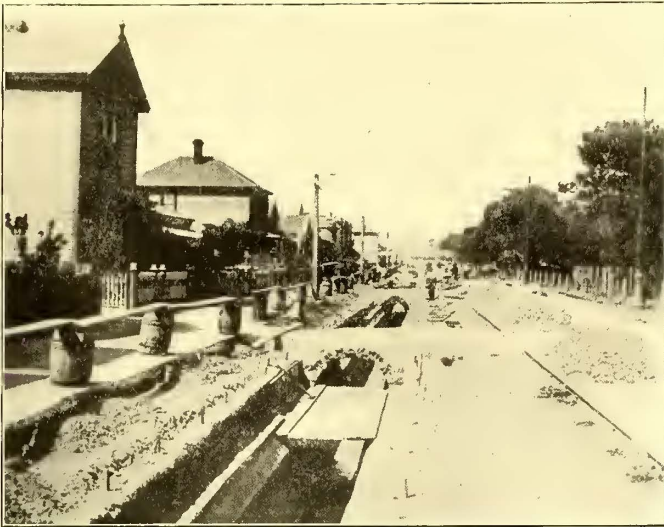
OPEN CULVERT ON KENT TERRACE
